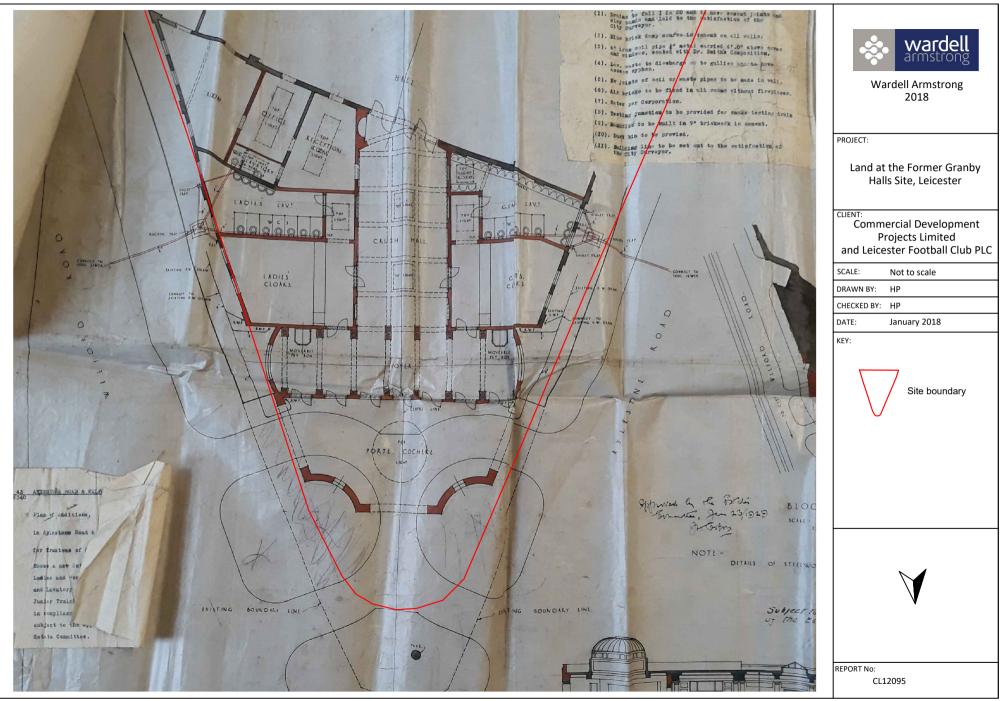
Plan of Proposed New Entrance to Granby Halls, 1929.
